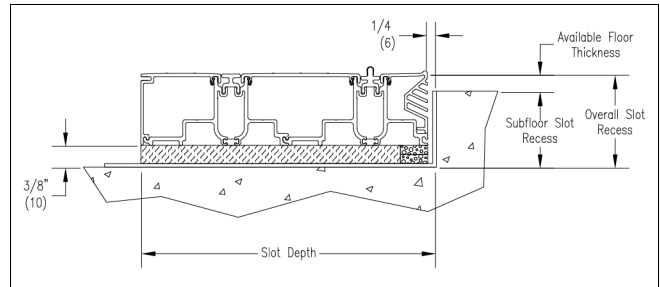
Open face slot with wood construction. Slot recess is 3/8" (10). Available flooring is 2" (51) however 3/4" (19) hardwood flooring is used leaving 1 1/4" (32) sill face exposed.
